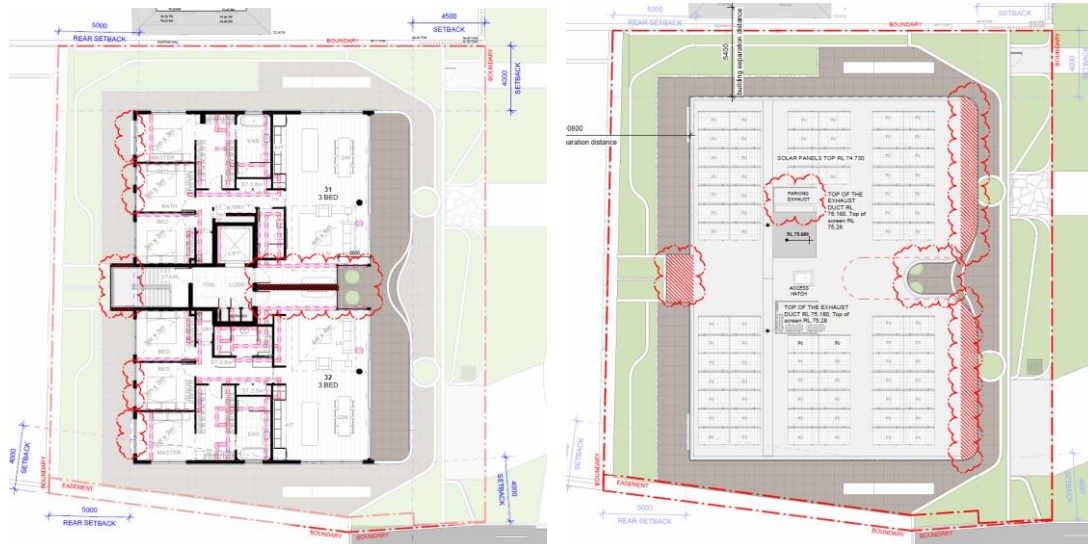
& 9: Approved modified third floor and roof plan under DA/526/2022/A – 3-4 Llanfoyst Street, Randwick (Source: Orosi)
